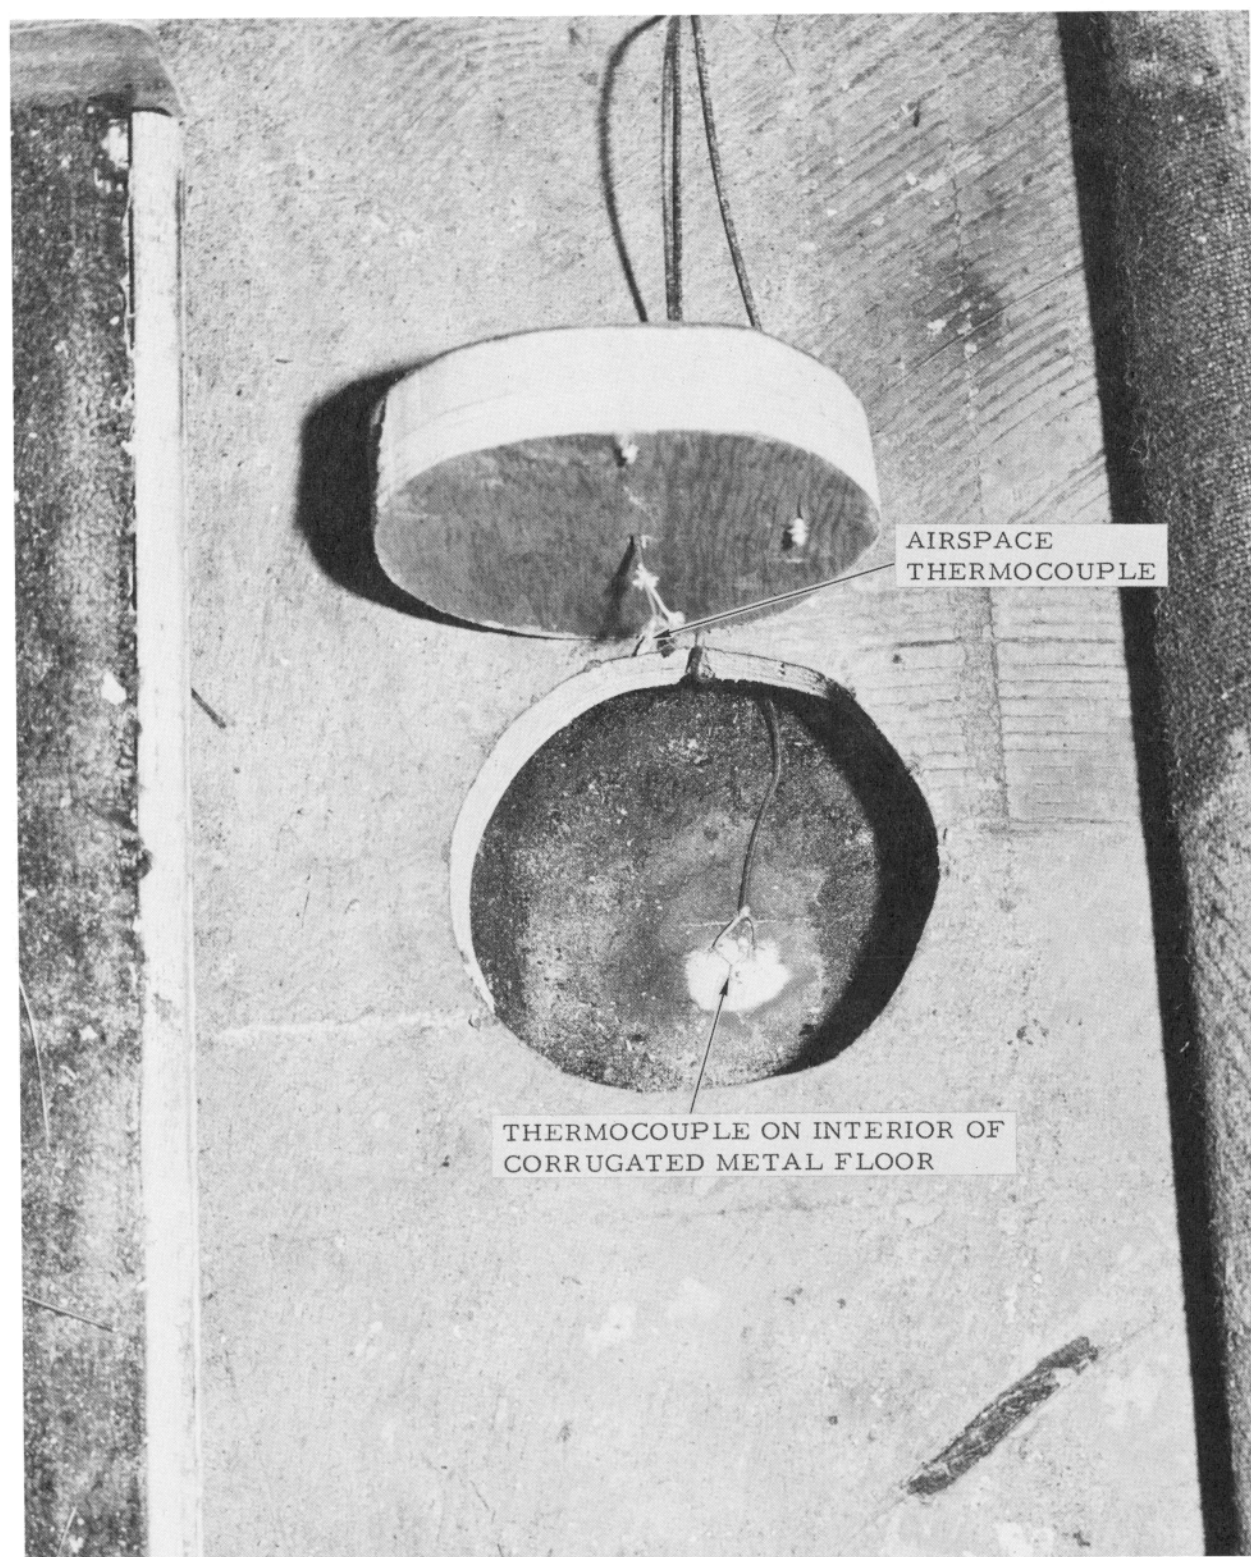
TYPICAL THERMOCOUPLE INSTALLATION ON THE INTERIOR METAL AND PLYWOOD FLOOR DECKING
